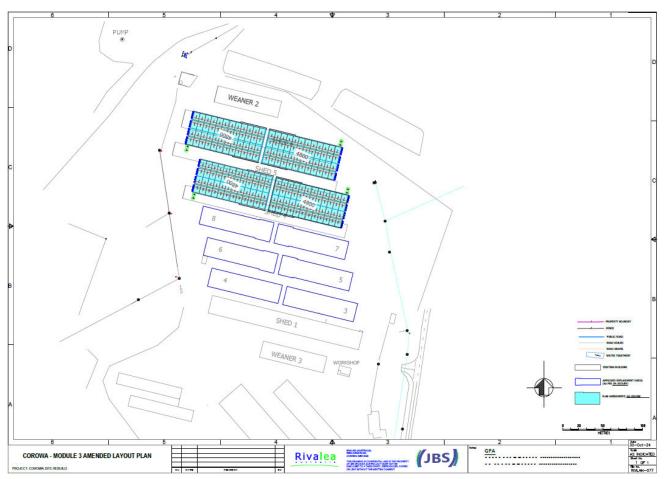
Proposed Modification to Site Layout (Rivalea, 2024)
